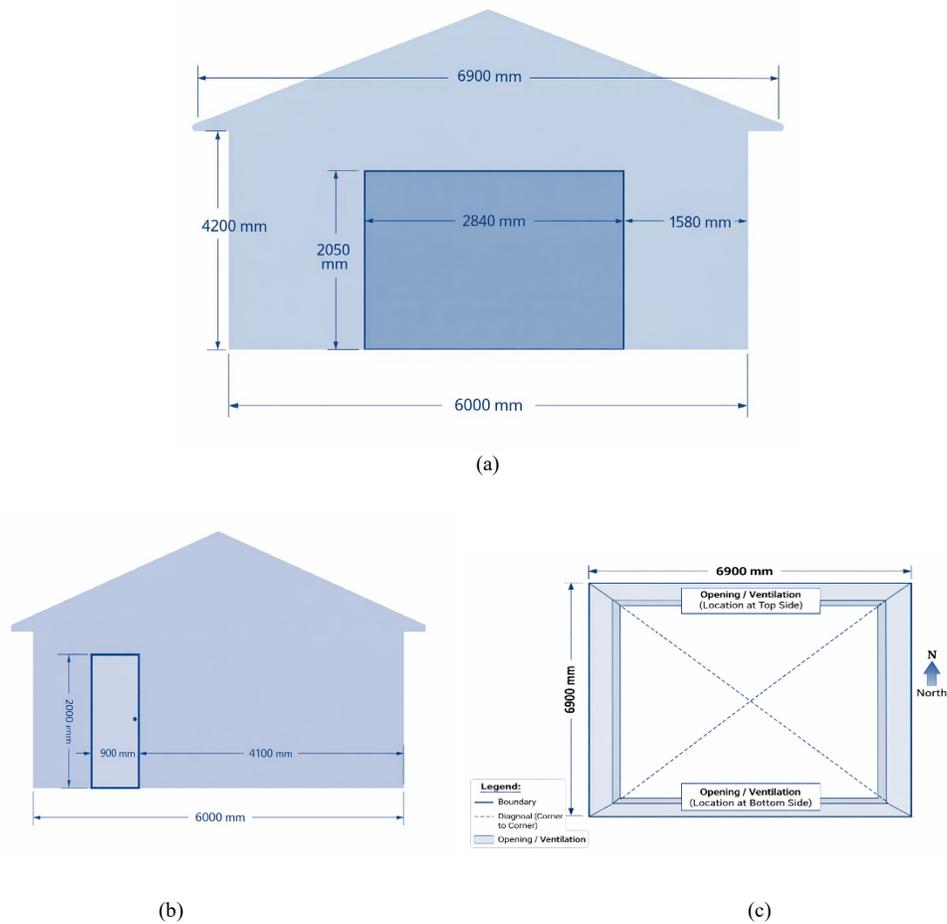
(a) North; (b) South; (c) Floor Plan for all Modules
